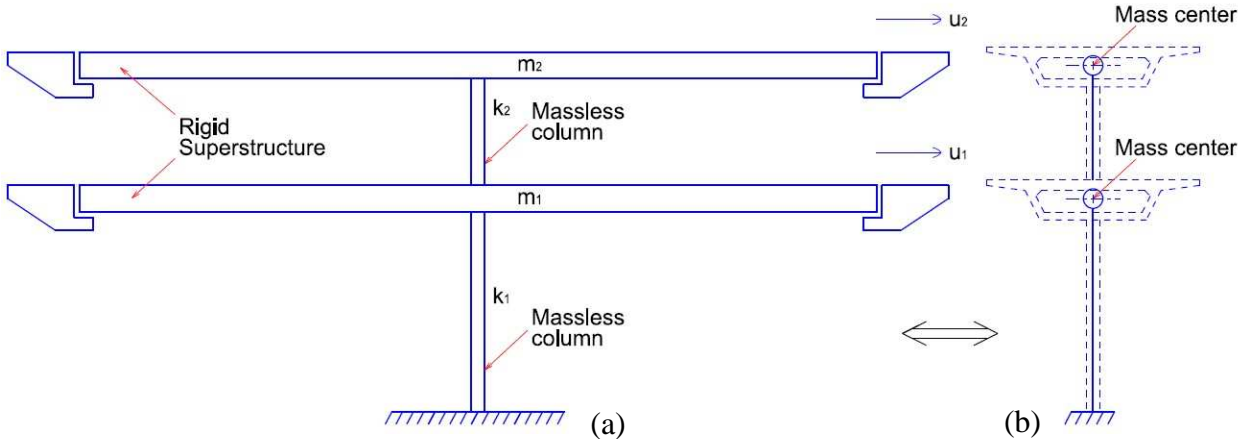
A two storey bridge shown in longitudinal and transverse direction (Sample 2)
